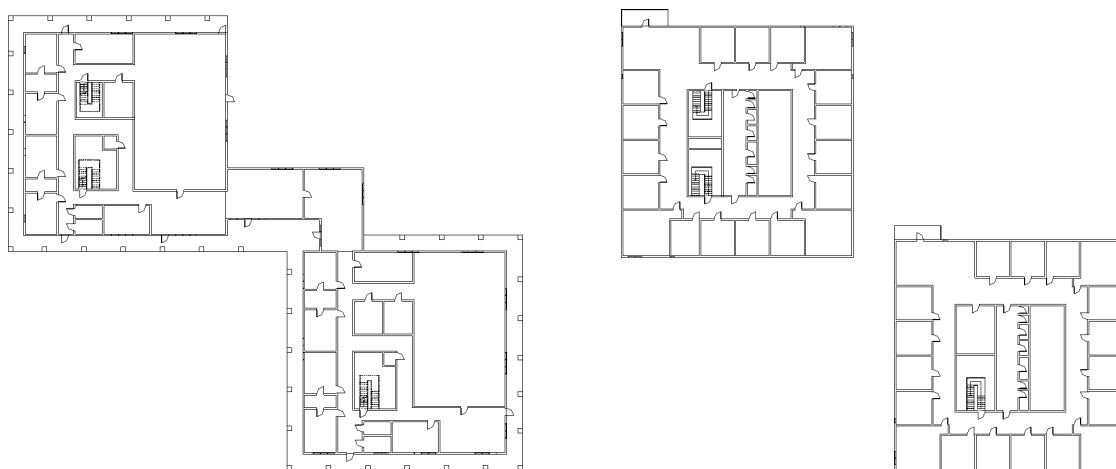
Floor plans for model connected dormitories in Revit., ground floor (left) and top floor (right).
